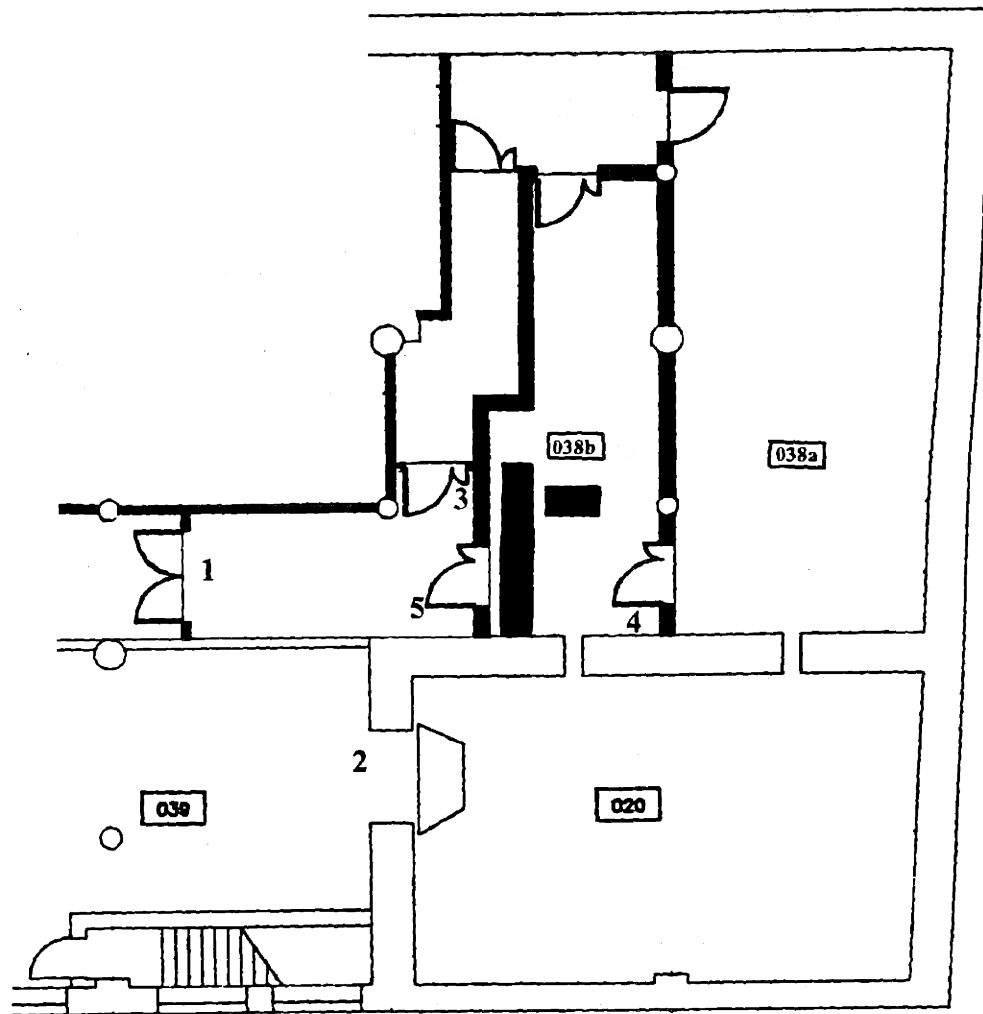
Floor plan of accelerator area showing new construction for DL-1 installation.
